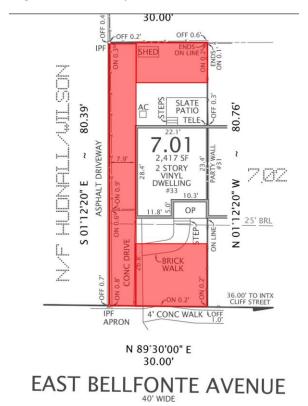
33 East Bellefonte Avenue - Non-buildable Area
